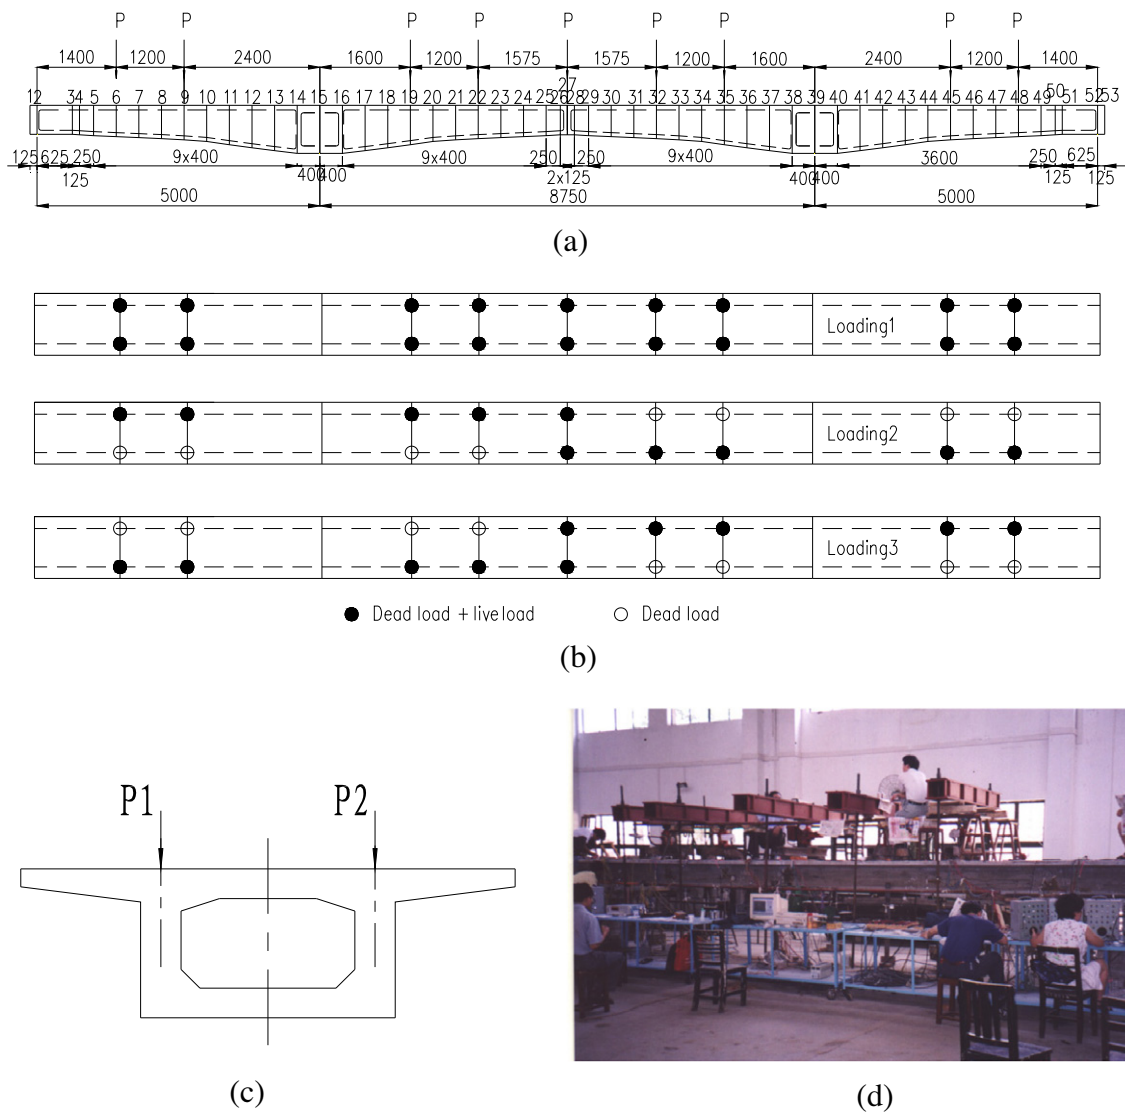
Model bridge static loading arrangement: (a) loaded sections; (b) plan view; (c) cross section loading; (d) test picture (center span) (units: mm).
